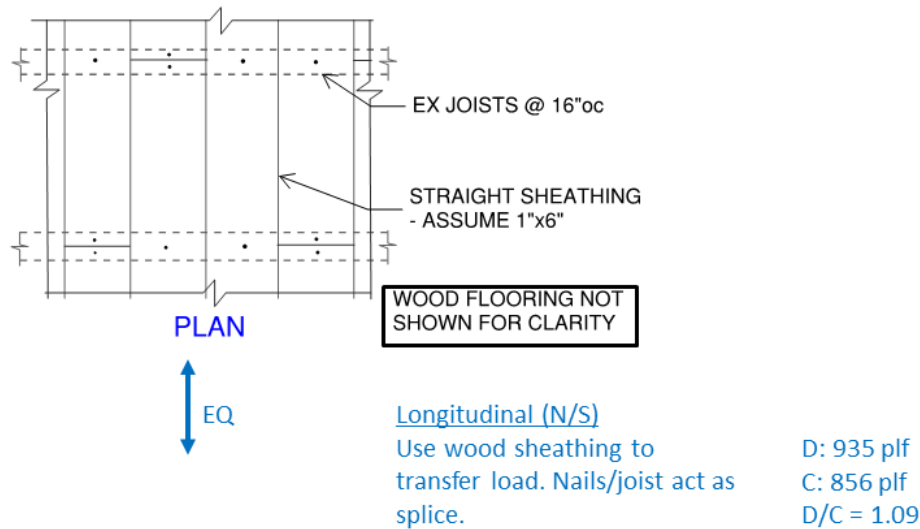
Wood flooring over straight sheathing—longitudinal direction.
